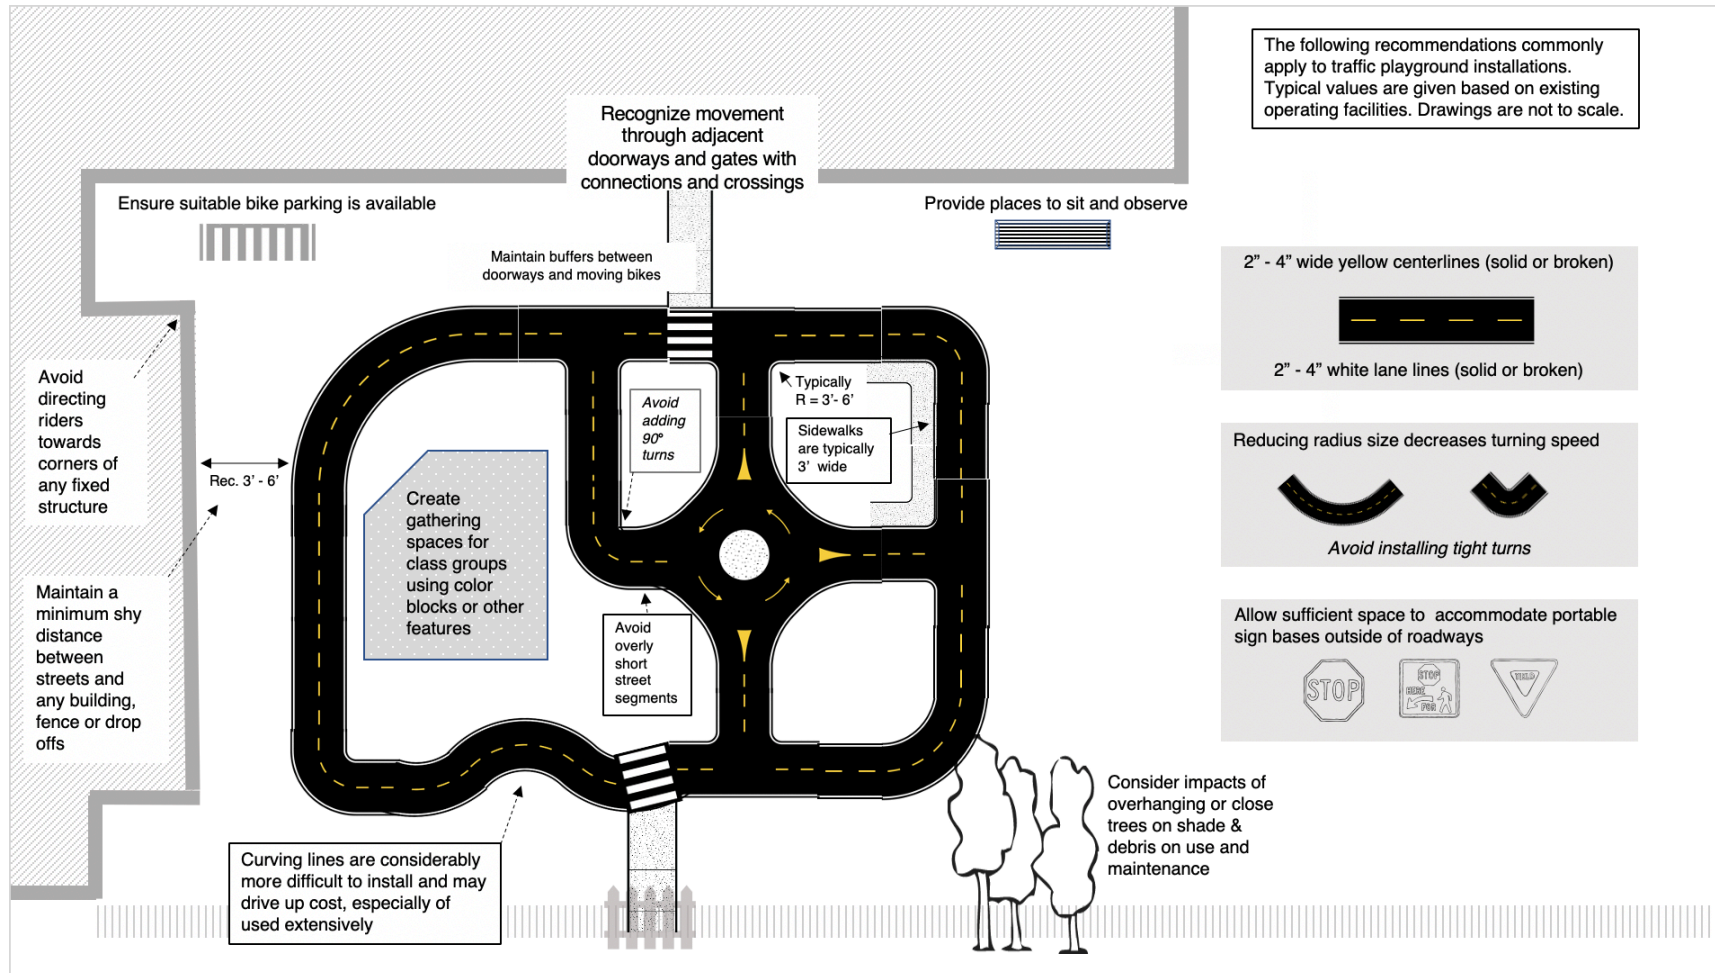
TRAFFIC PLAYGROUND PAVEMENT MARKINGS
